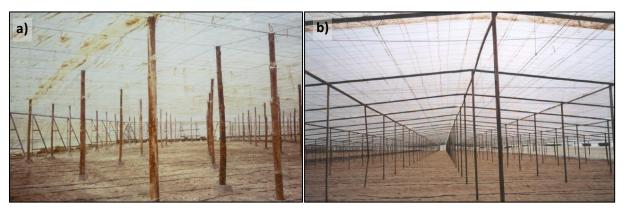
Interior image of elementary greenhouses without roof ventilation, with flat structure and wooden pillars (a) and with gabled structure of metal tubes (b).
